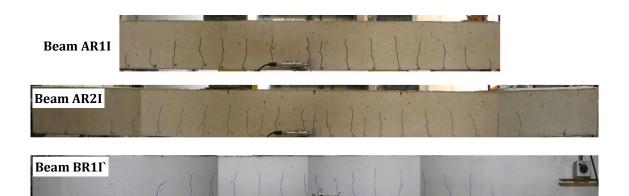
Crack patterns of the un-strengthened beams subjected to two loading/unloading cycles.
